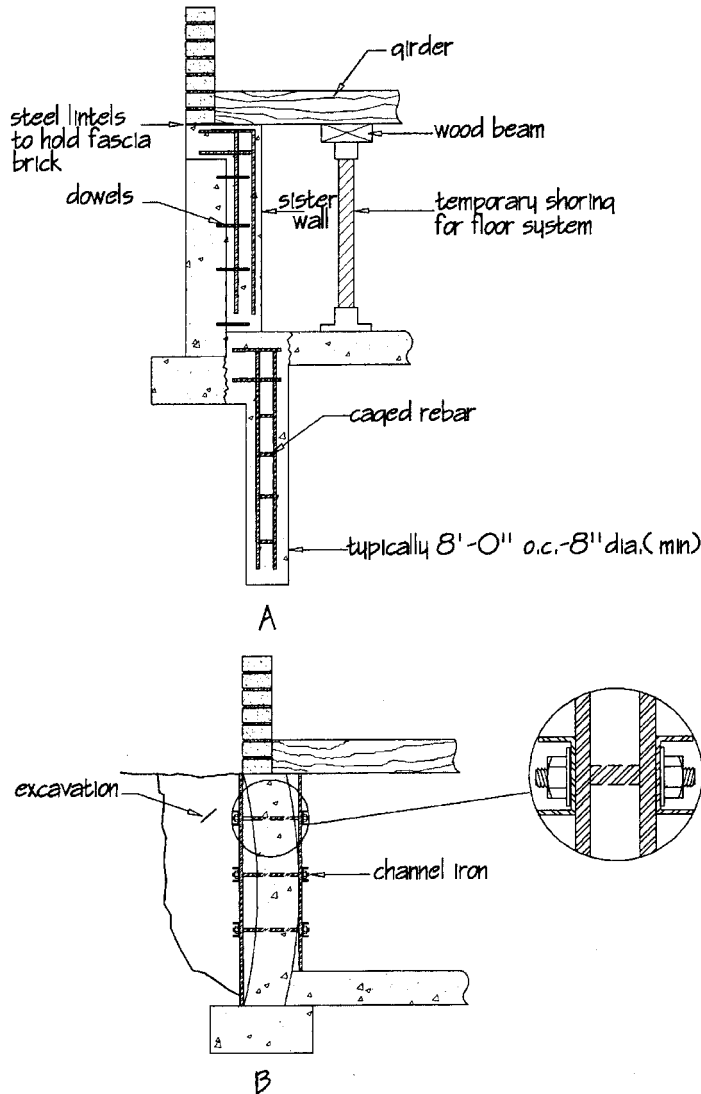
B.5.1. Basement/foundation wall repair. (a) Failure in foundation (basement) wall, transfer or load; (b) failure in foundation wall, plumbing desired.
